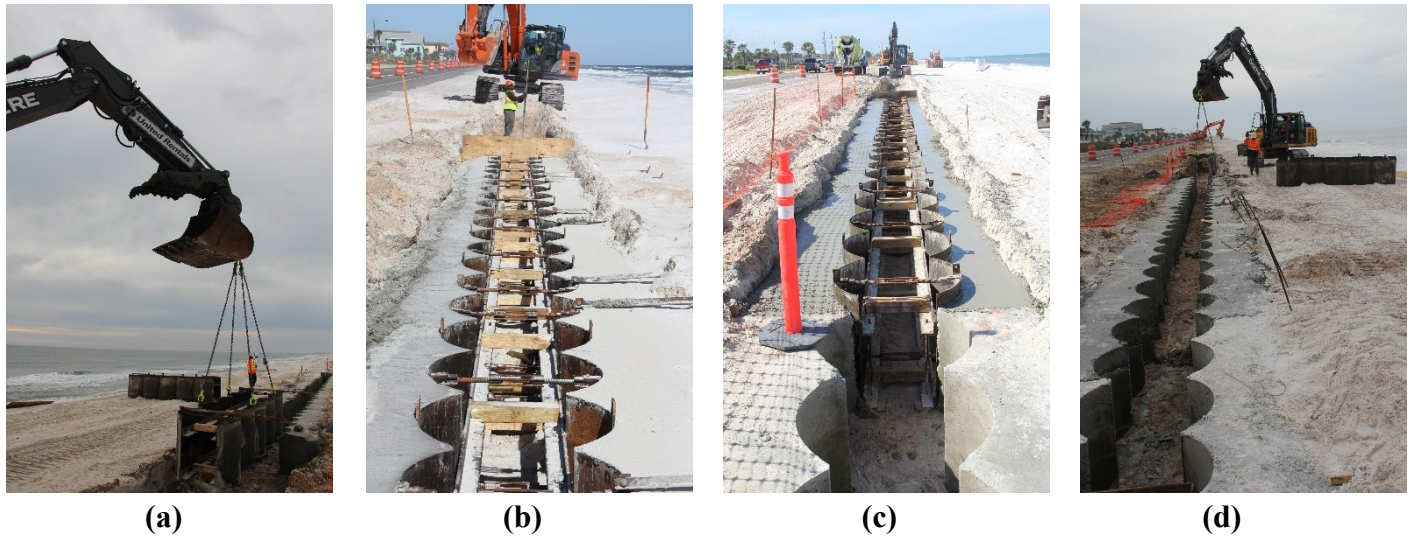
Sequence of guide wall construction to facilitate the secant-pile wall alignment and installation.
